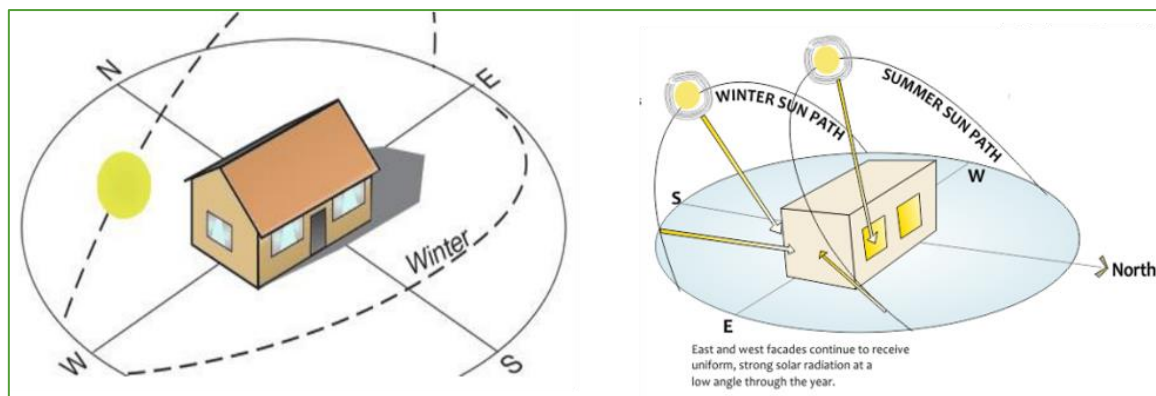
Longer side of the building should be towards north and south (NEECA)
